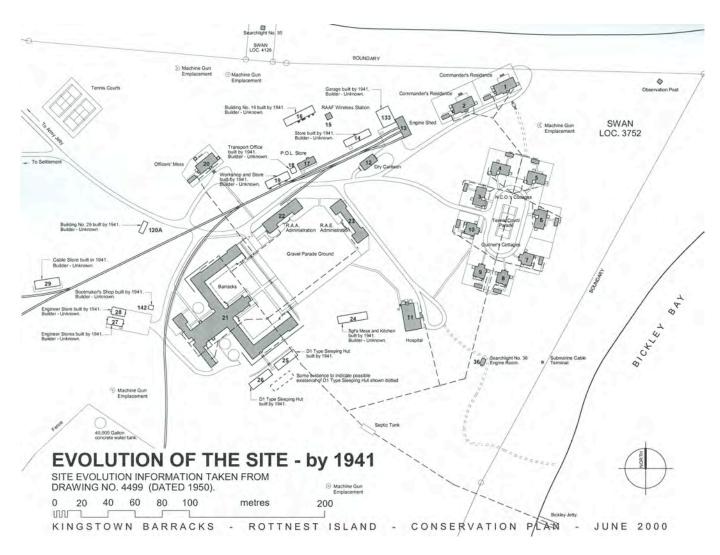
Detail of Kingstown Barracks in 1941. From Ralph Hoare Architect: Kingstown Barracks Conservation Plan, 2000.
